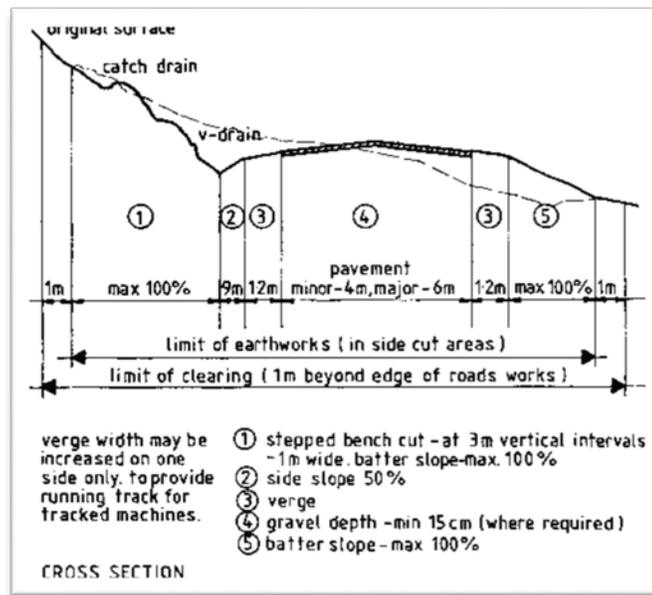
Example of ideal road layout. Wear surfaces and finished width will vary. (Forest Solutions)
